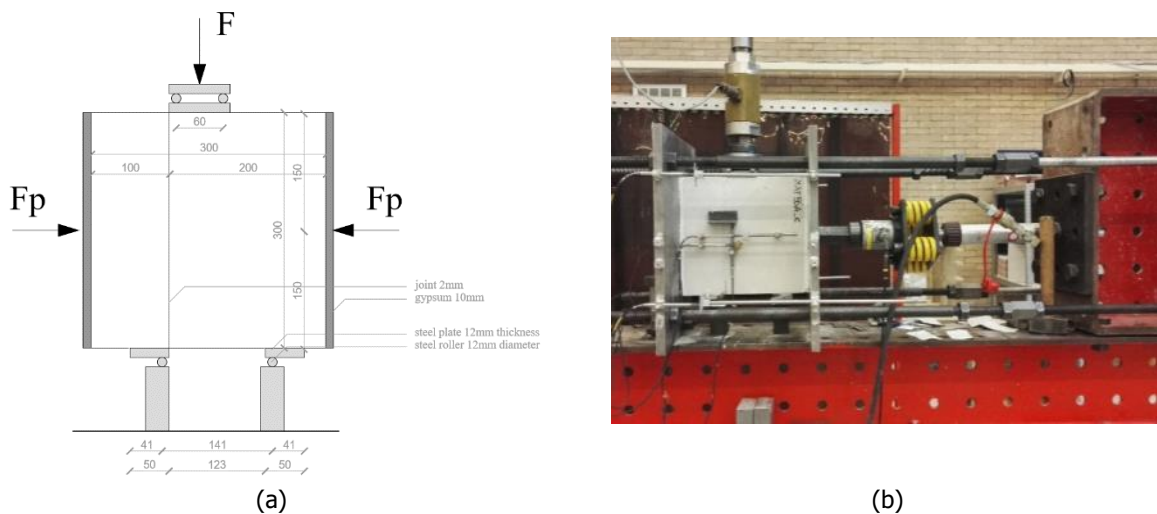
Shear-compression test on the CS element masonry: (a) adopted specimen; (b) test set-up.
